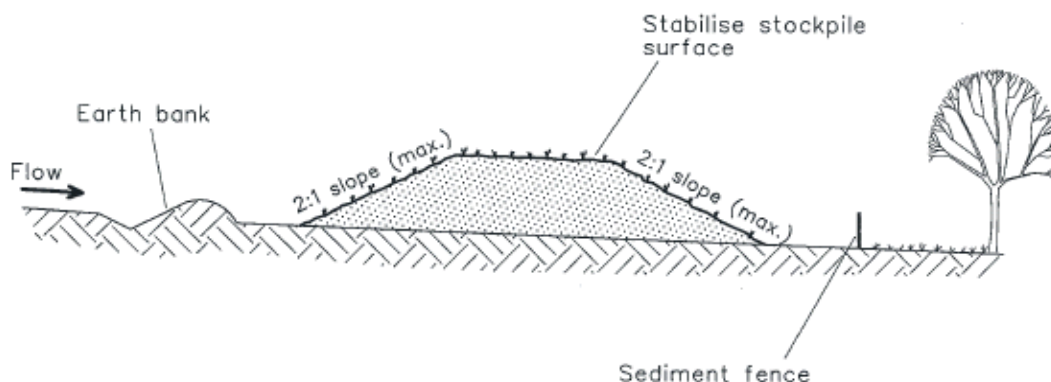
Construction of a Stockpile (Source: the 'Blue Book')
